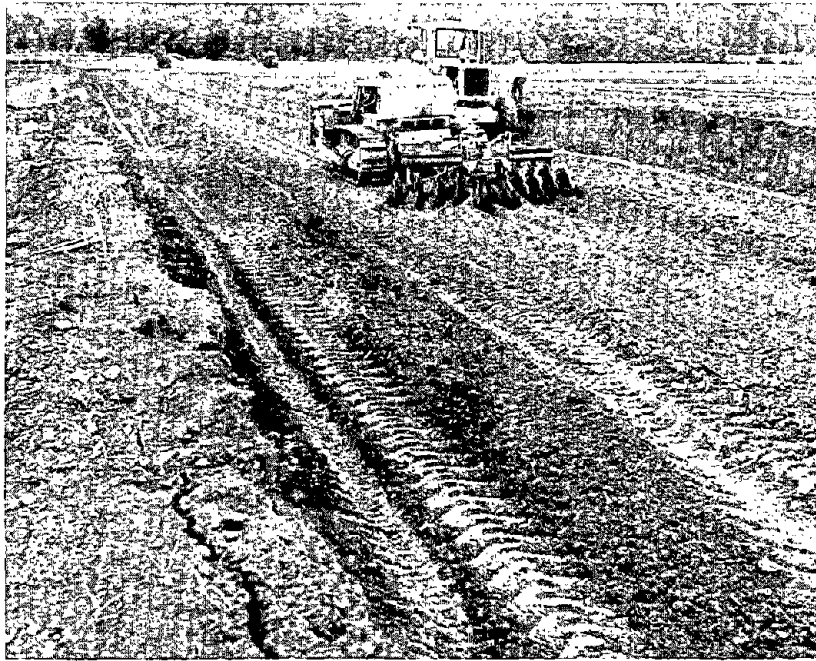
Fly ash being disced into highly plastic clay subgrade for industrial access road.
